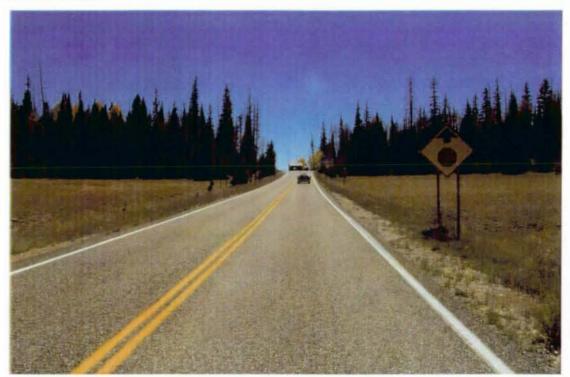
MP 0.00 - Begin Route at North Park Boundary.
